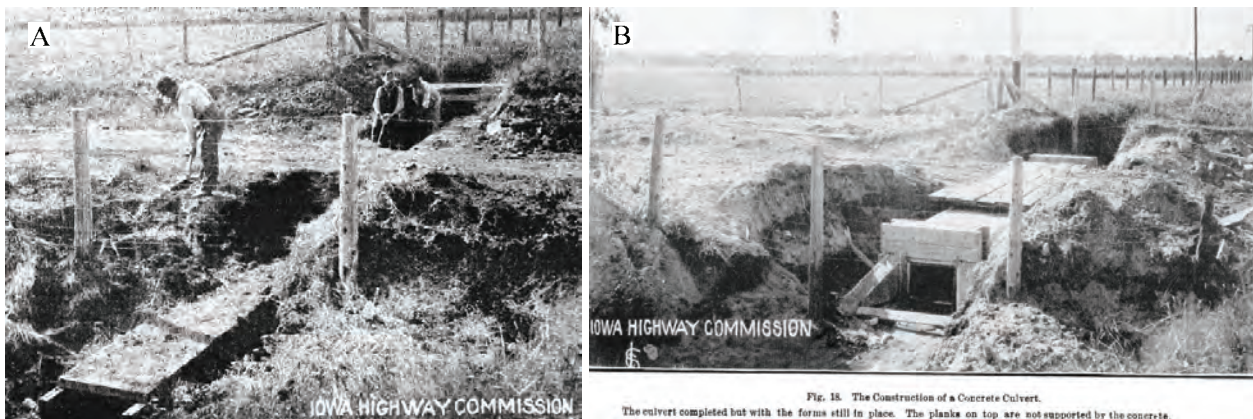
A. Road School Demonstration Culvert under construction (ISHC 1905a:44). B. Finished structure (ISHC 1905a:46).
